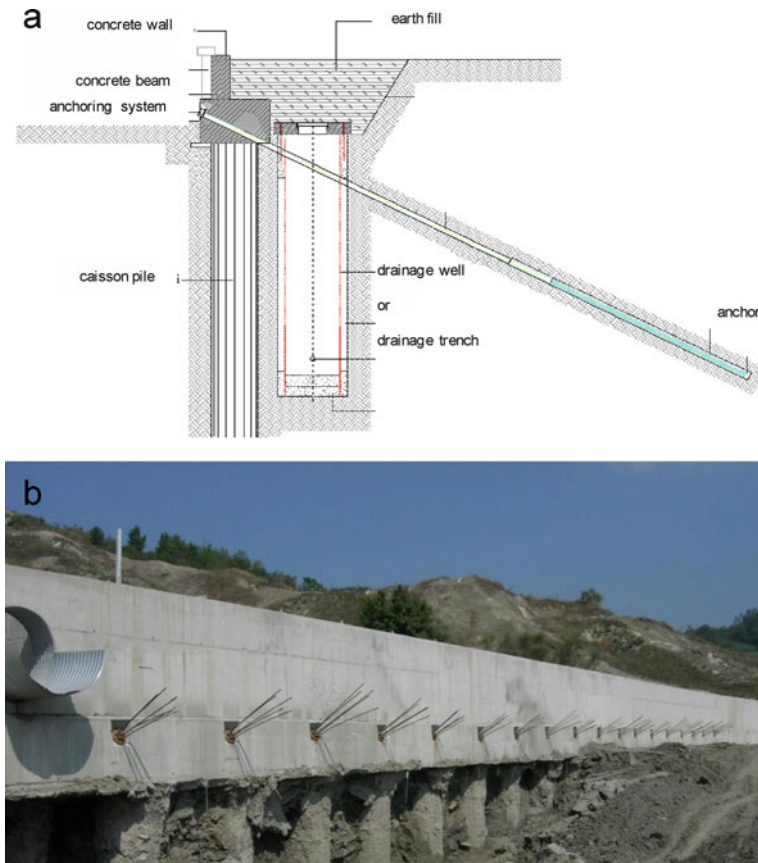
Example of bored caisson piles coupled to concrete walls (Ca'Lita landslide, northern Apennines, Italy). (a) General construction scheme; (b) exposed caisson piles, reinforced concrete beam and anchoring systems (© G. Truffelli)
